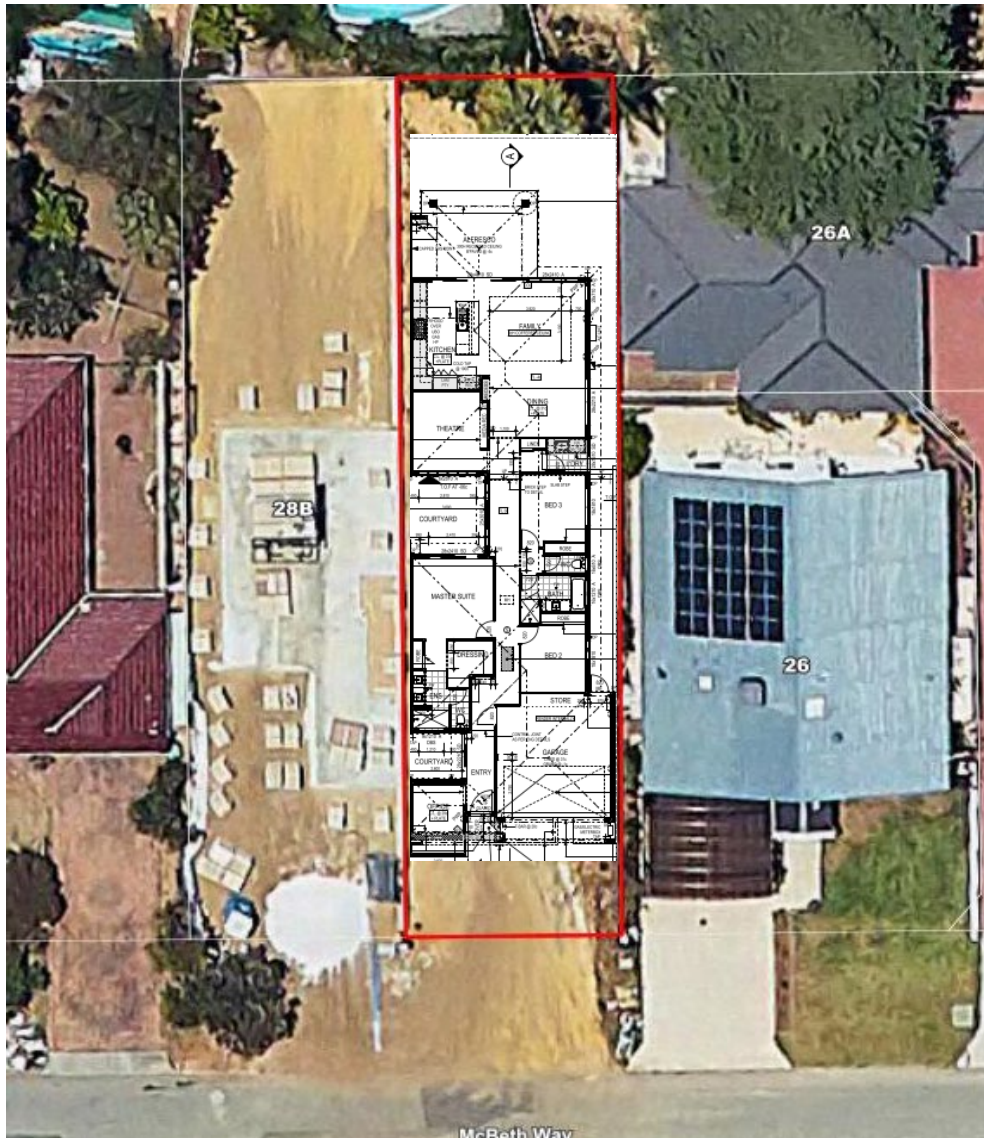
Development floor plan and setbacks with respect to adjoining properties
